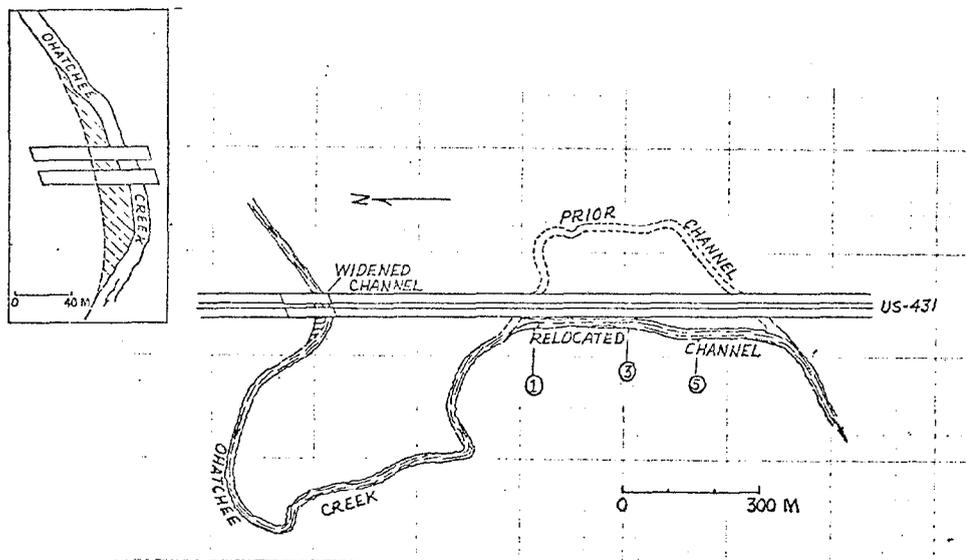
Plan sketch of Ohatchee Creek channel relocation and (inset) widening of channel at bridge. Circled numerals indicate location of surveyed cross sections.
